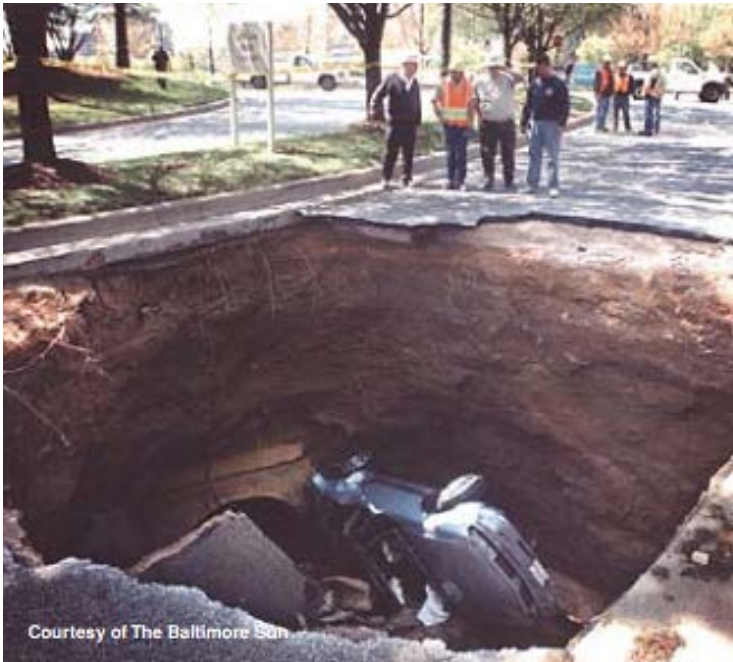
A 17-year old 84 in. culvert failure in Maryland, USA (ACPA 2008).
